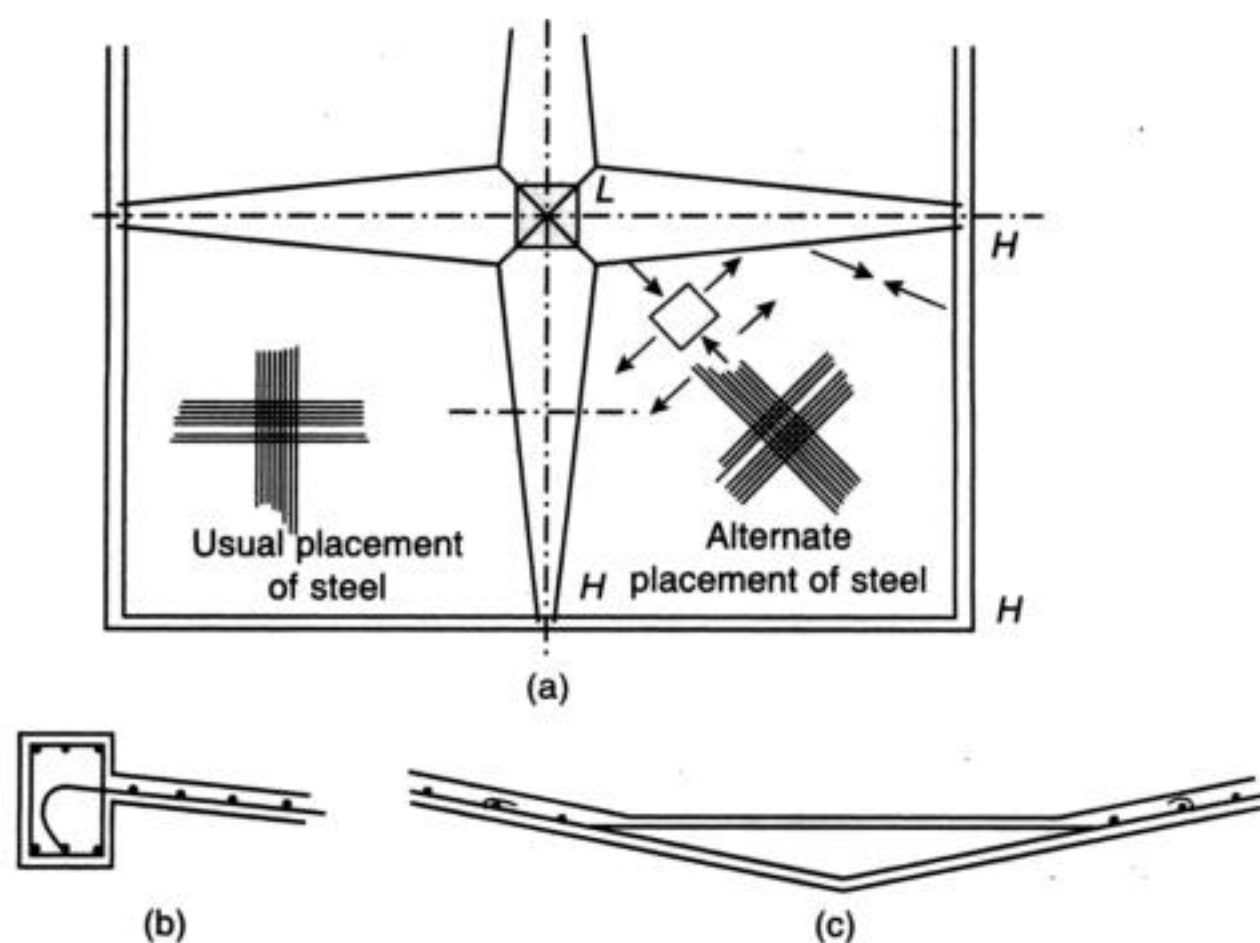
Plan and details of an inverted umbrella roof made with hypar shells: (a) General arrangement, (b) External edge beam, and (c) Internal edge beam. (See also Fig. 11.2b.)
